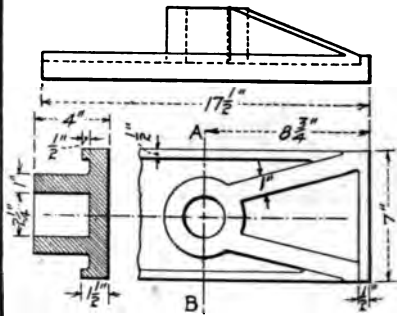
Cast-Iron Shoe for Concrete Column, Twelve-Story Loft Building.
